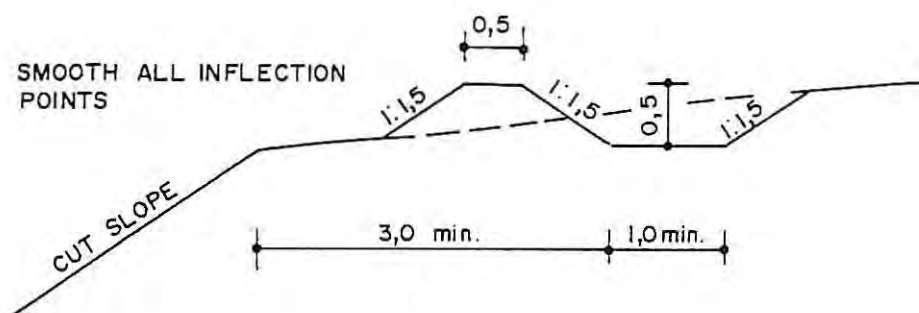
TYPICAL CATCHWATER DRAIN DIMENSIONS
